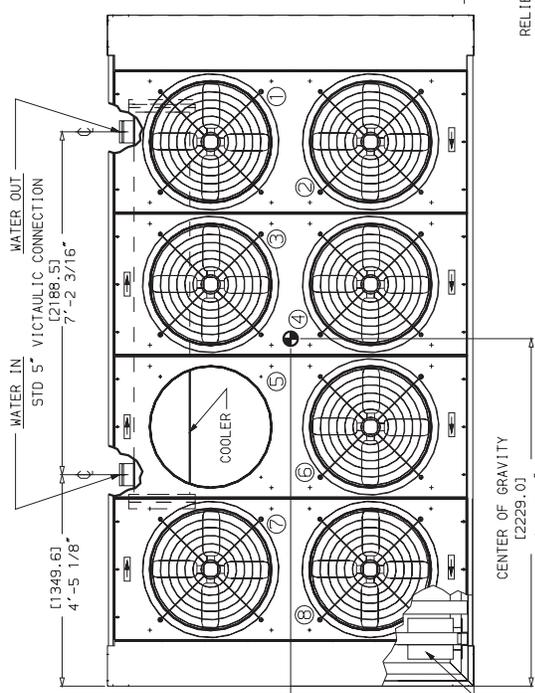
Dimensions, Unit Sizes 080, 230B
